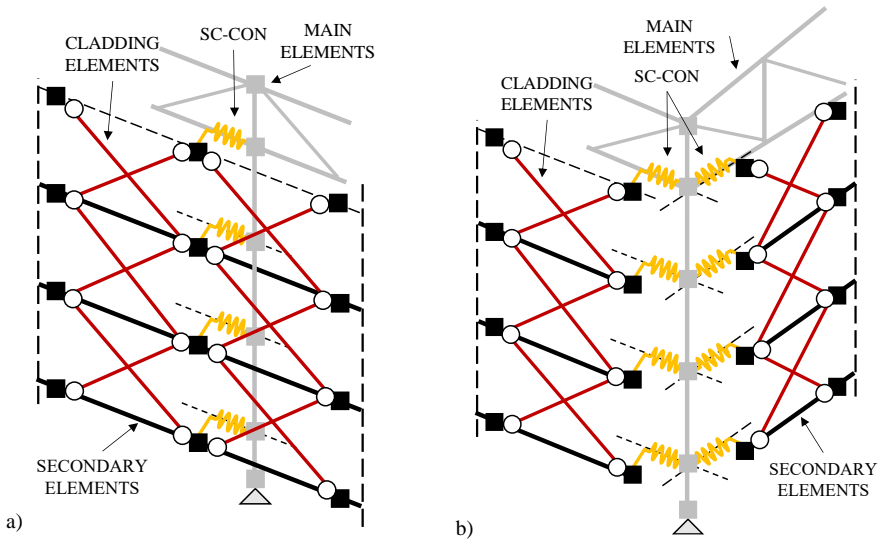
Sketches of the building envelope model considering secondary connections: (a) generic column; (b) corner column.
